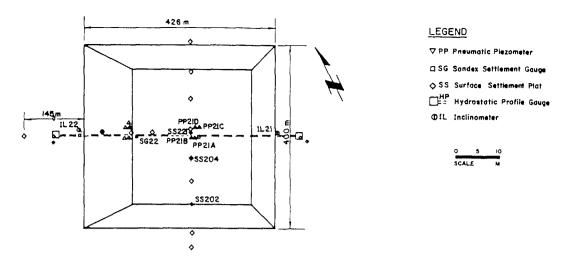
Instrumentation Plan of Nong Ngu Hao Test Embankment with Sand Drains(Moh & Woo,1983)
